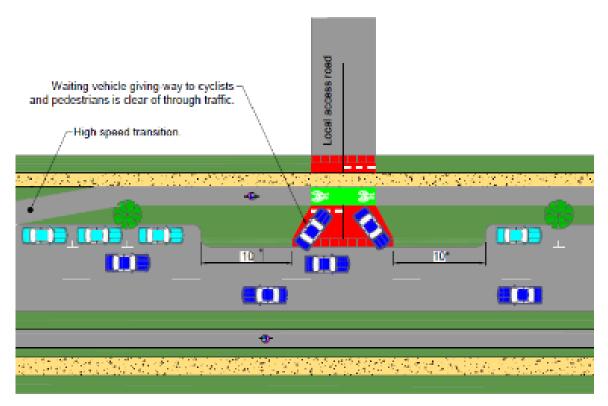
One-Way Cycle Track and Footpath at Side Road
